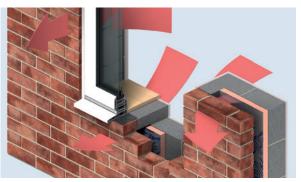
Heat Loss Paths Around a Typical Window Opening in a Masonry Cavity Wall Construction
